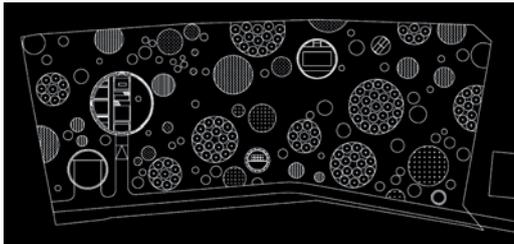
D. Radwański, R. Rutkowski, Single-family house in Mikołów, site plan, (source: own resources)
